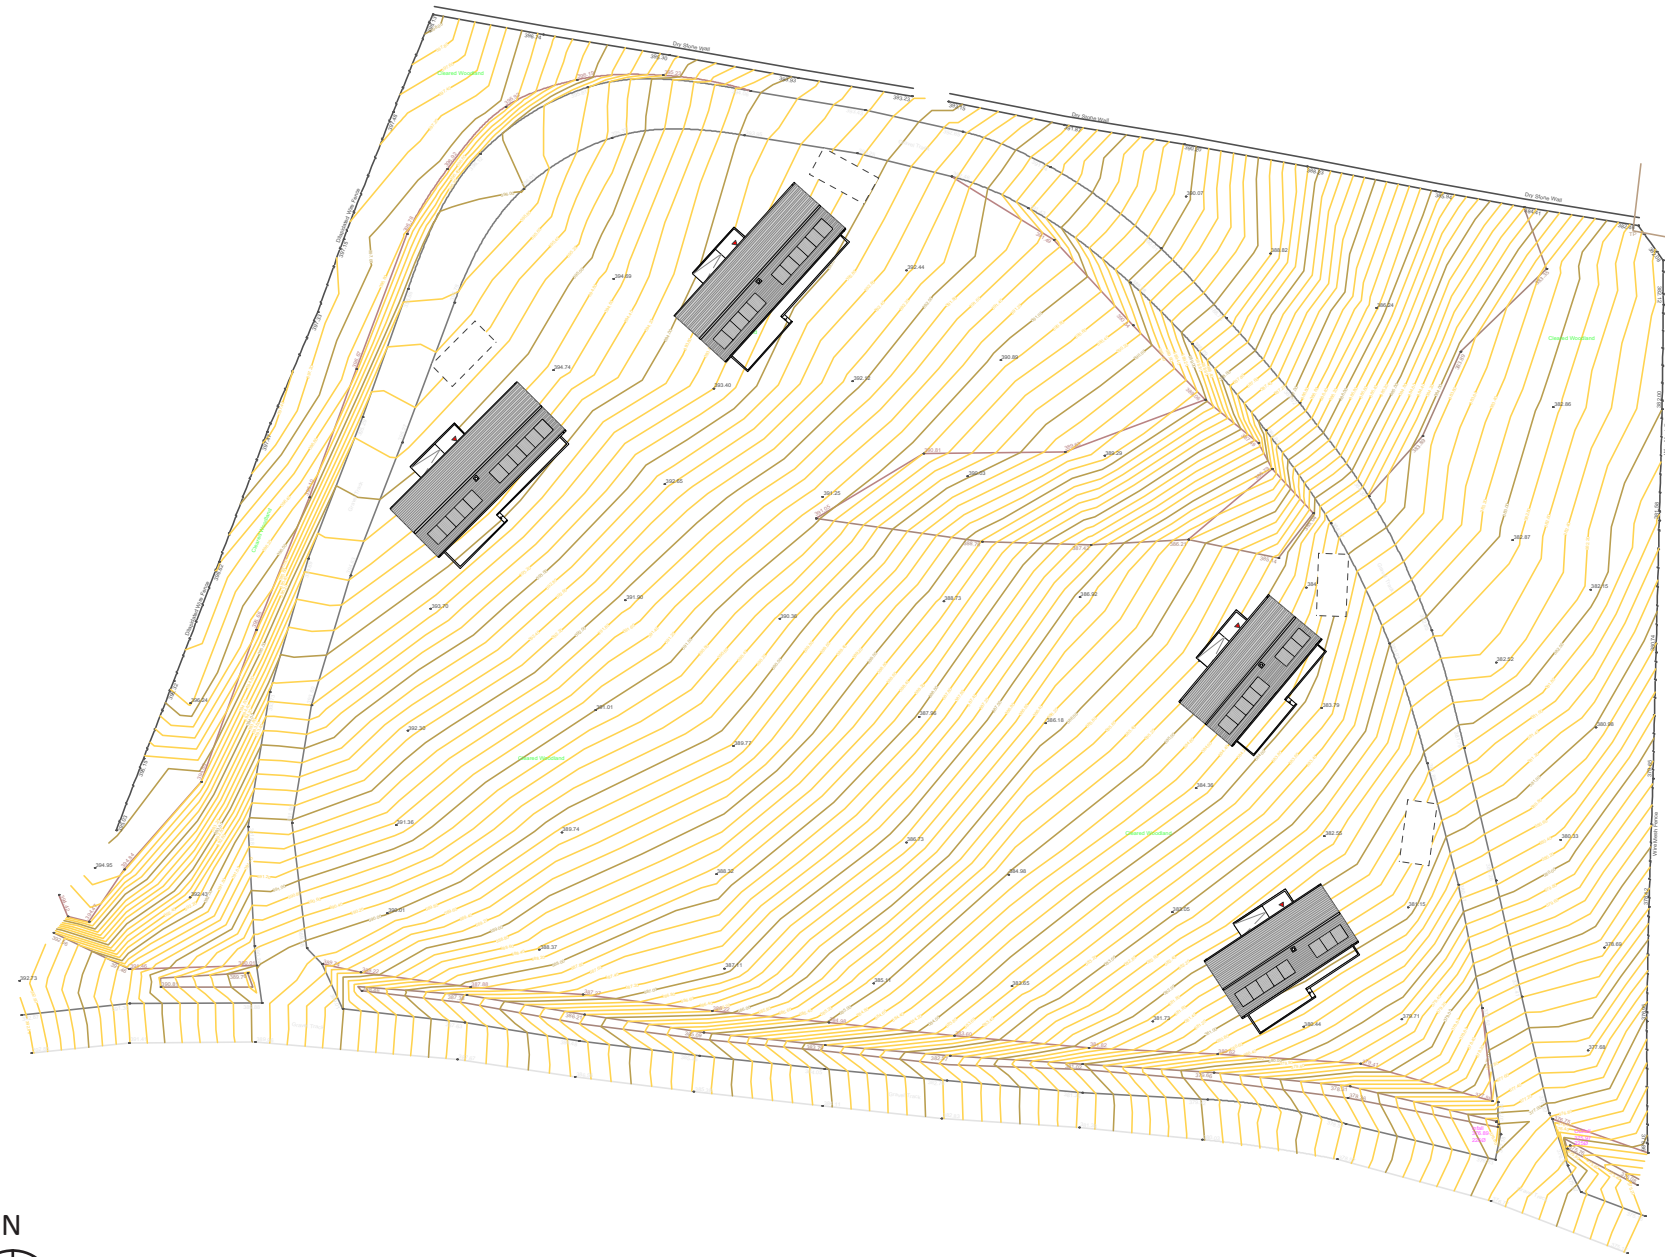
Proposed Site Plan depicting location of 4no. lodges. NOT TO SCALE
